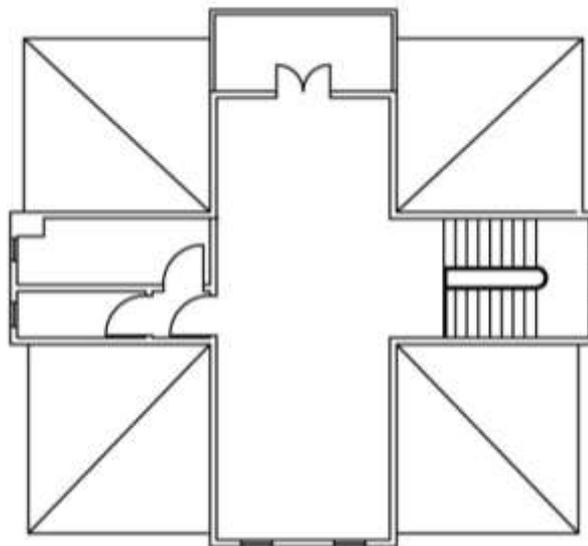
The penthouse plan of the house at 166 lot 5 parcel
